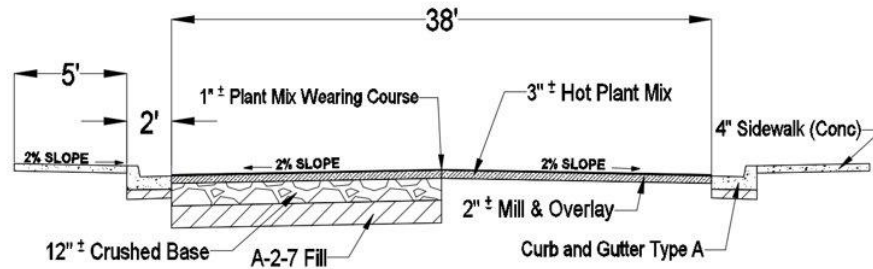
Van Buren Cross Section (Sta: 10+45 to Sta: 36+41)
